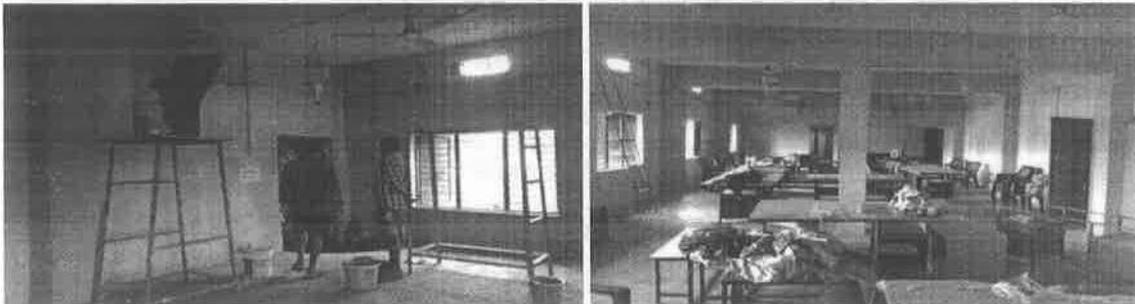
Painting work has been done in the common classroom, Government Higher Secondary School, Tundri.
